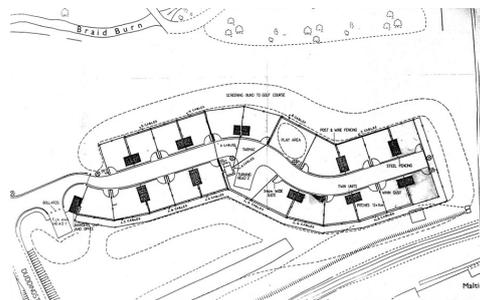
Plan of North Cairntow Gypsy Travellers' Site, Duddingston, site plan from City of Edinburgh Council, c1983
